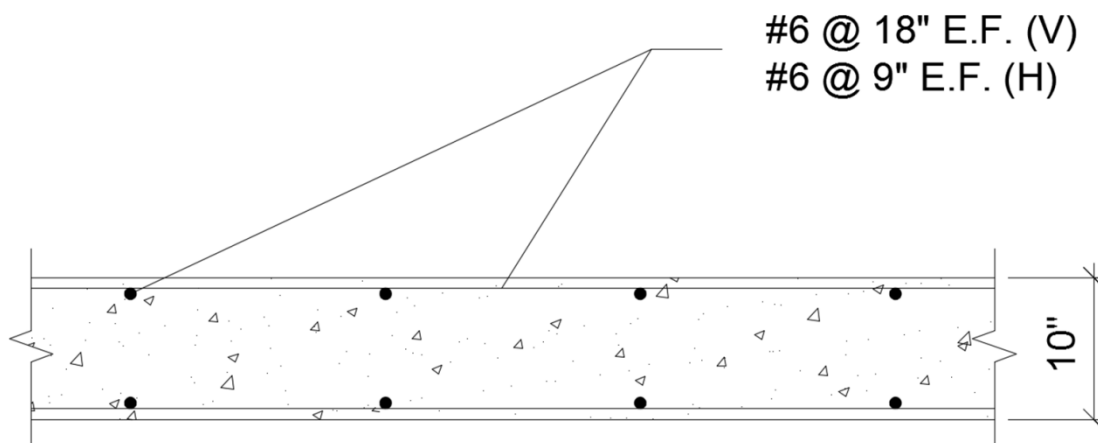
Segment of exterior wall cross-section at the 3rd – 7th floor level based on SDC D design.
